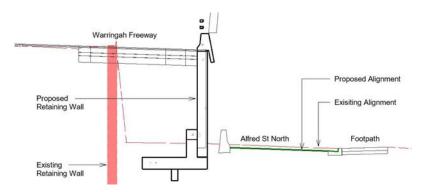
showing the location of the existing retaining wall and the proposed and approved WFU retaining wall
